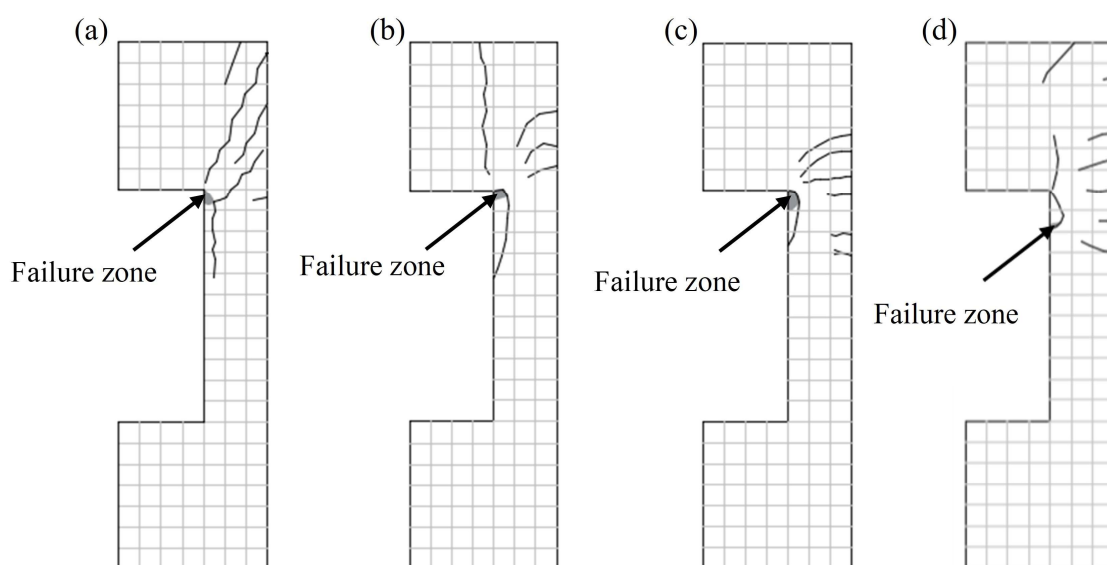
Cracking pattern of the tested columns at failure. (a) Column C1, (b) Column C2, (c) Column C3, and (d) Column C4.
